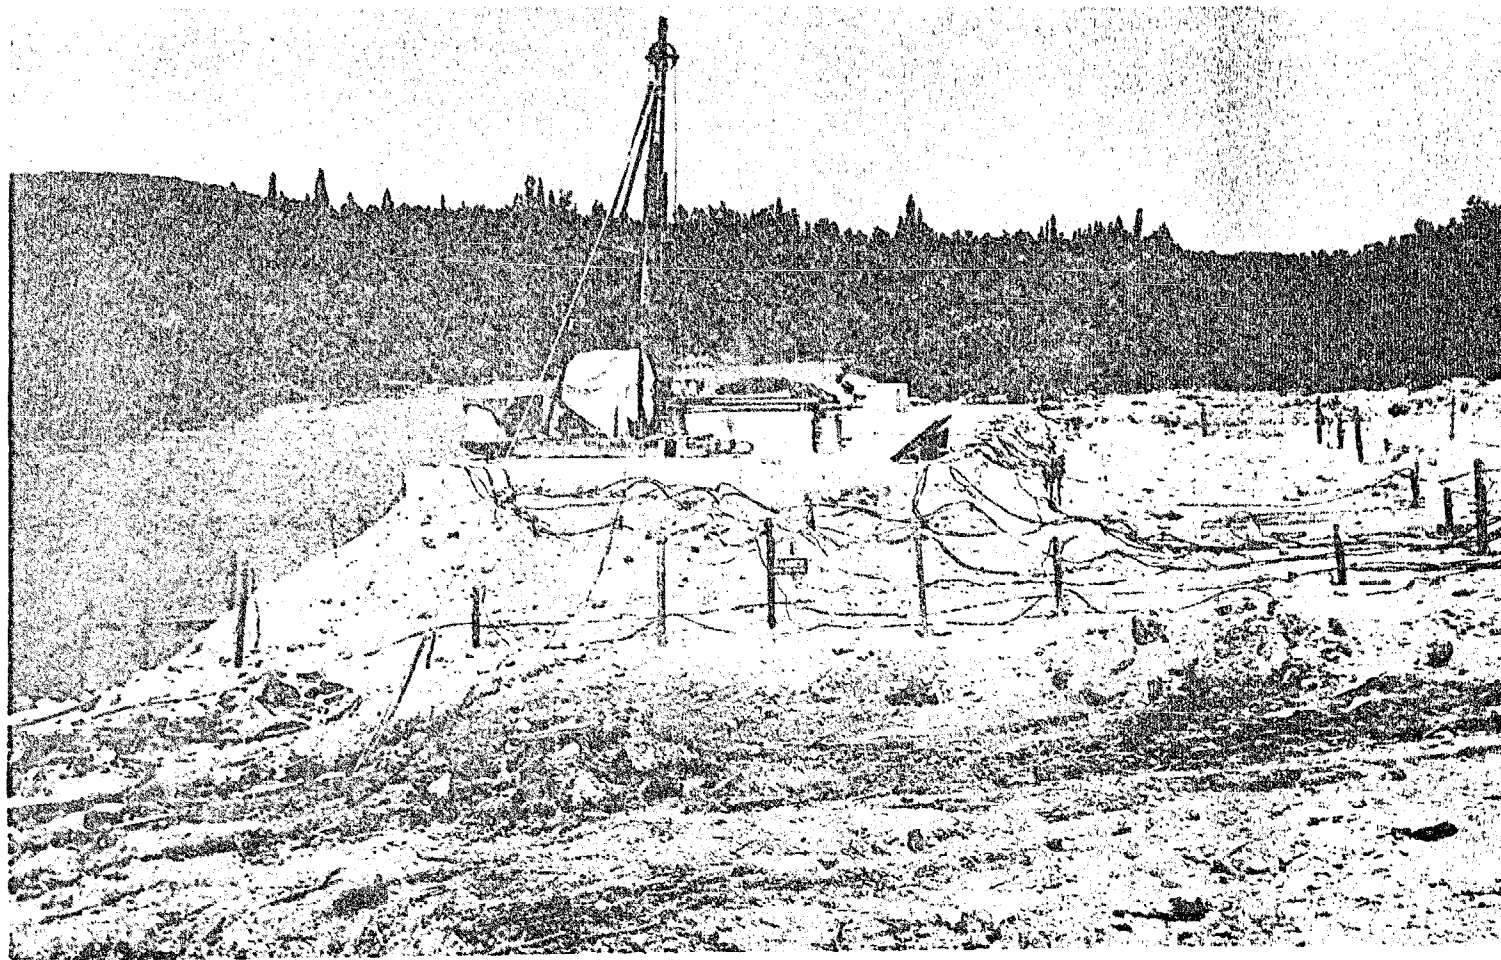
VIEW OF ELECTRICAL INSTALLATION AT EAST PIER, BIG PIC RIVER BRIDGE,
